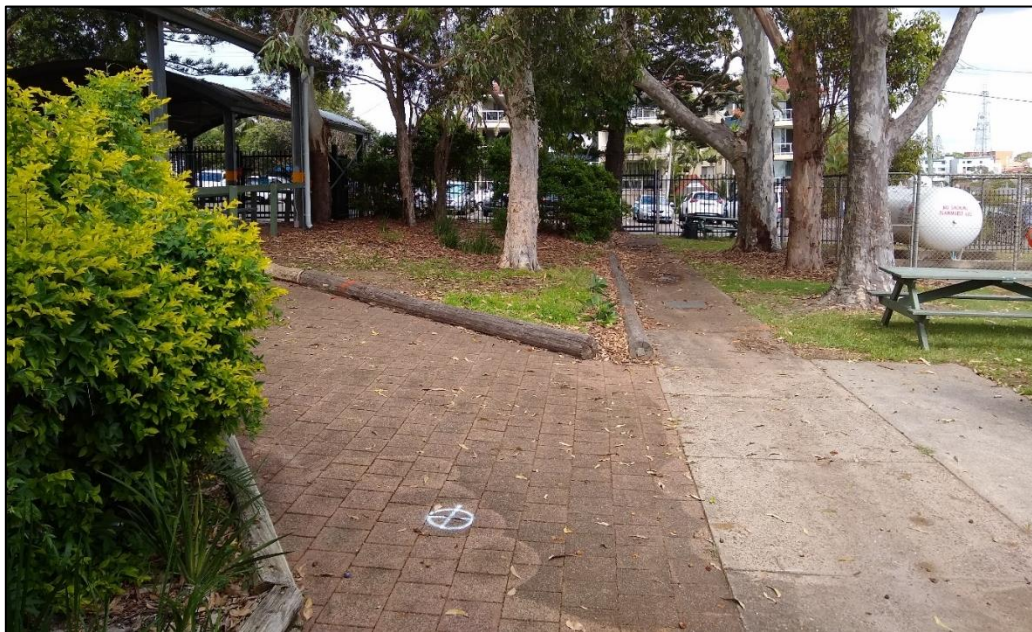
View from western boundary of the proposed CAPA building - looking west towards Owen Street
